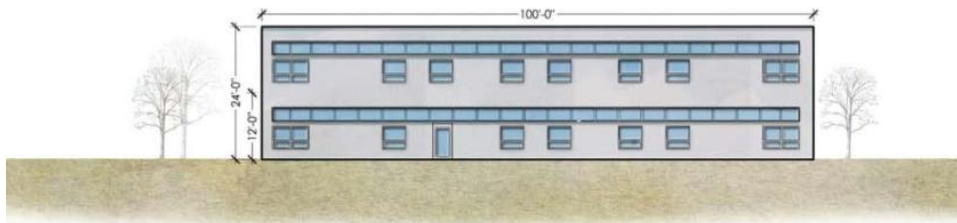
Net Zero office north and south elevation source: Maclay Architects
